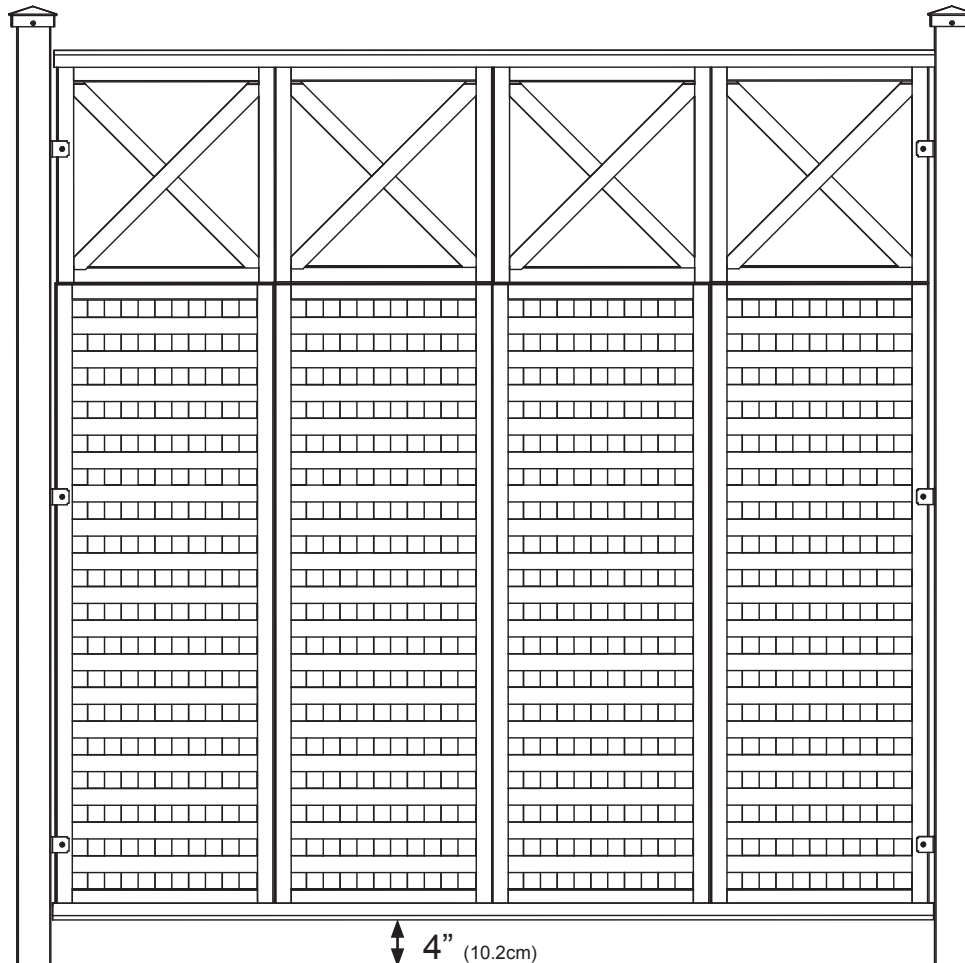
Predrill Holes and Fasten with S5- 1" Pan Head Screw
